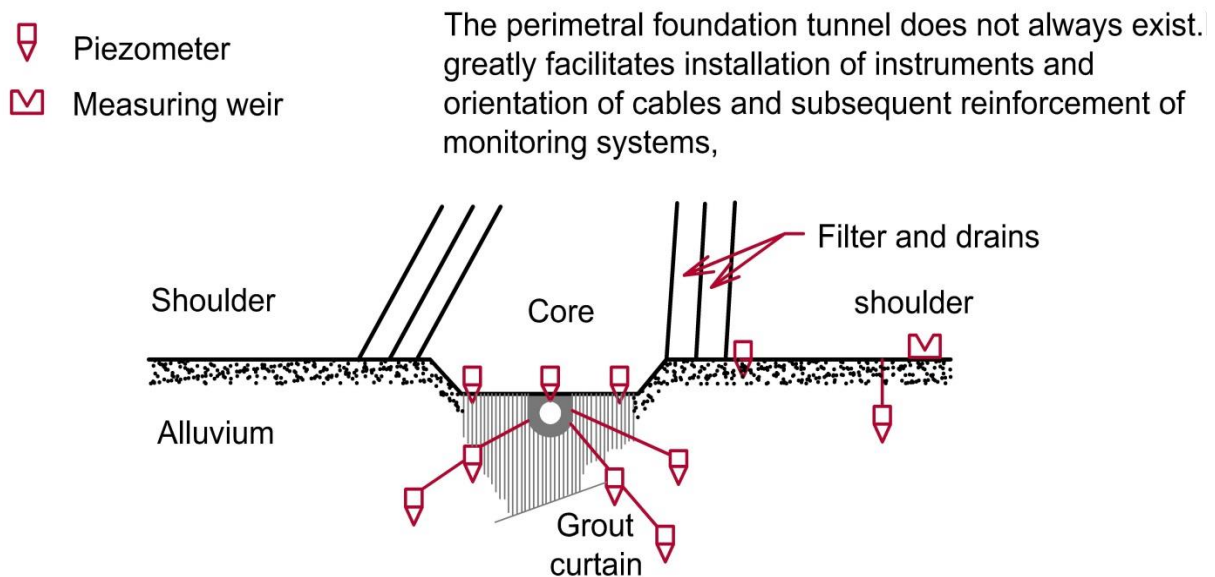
Core Dam with Perimetral Tunnel Positioning of Pore Pressure Sensors
